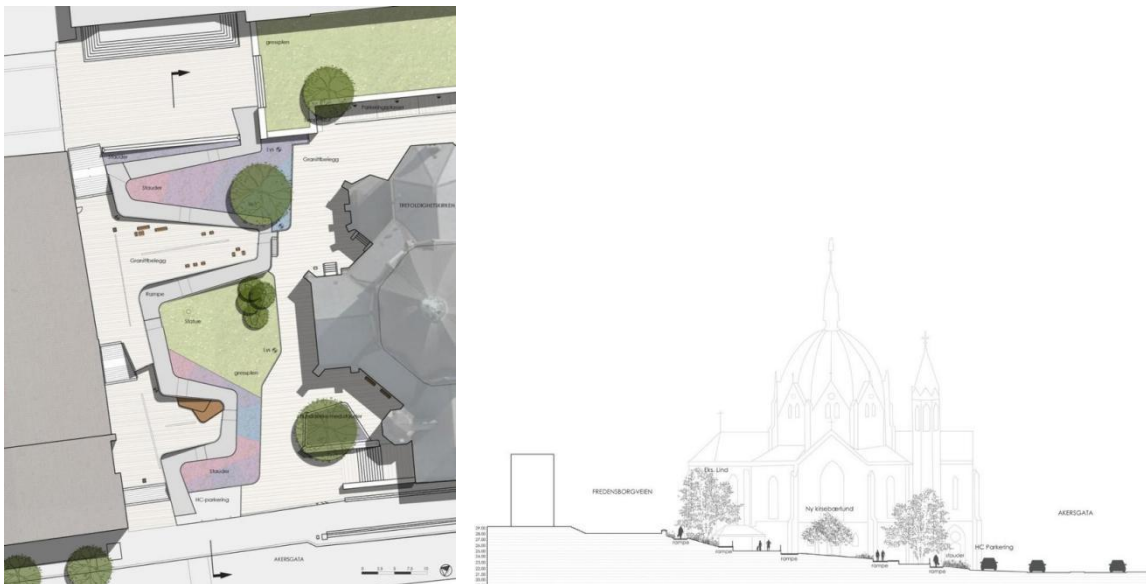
Master plan and Section of Schandorff Square (Source: Stengen & Bergo AS)
